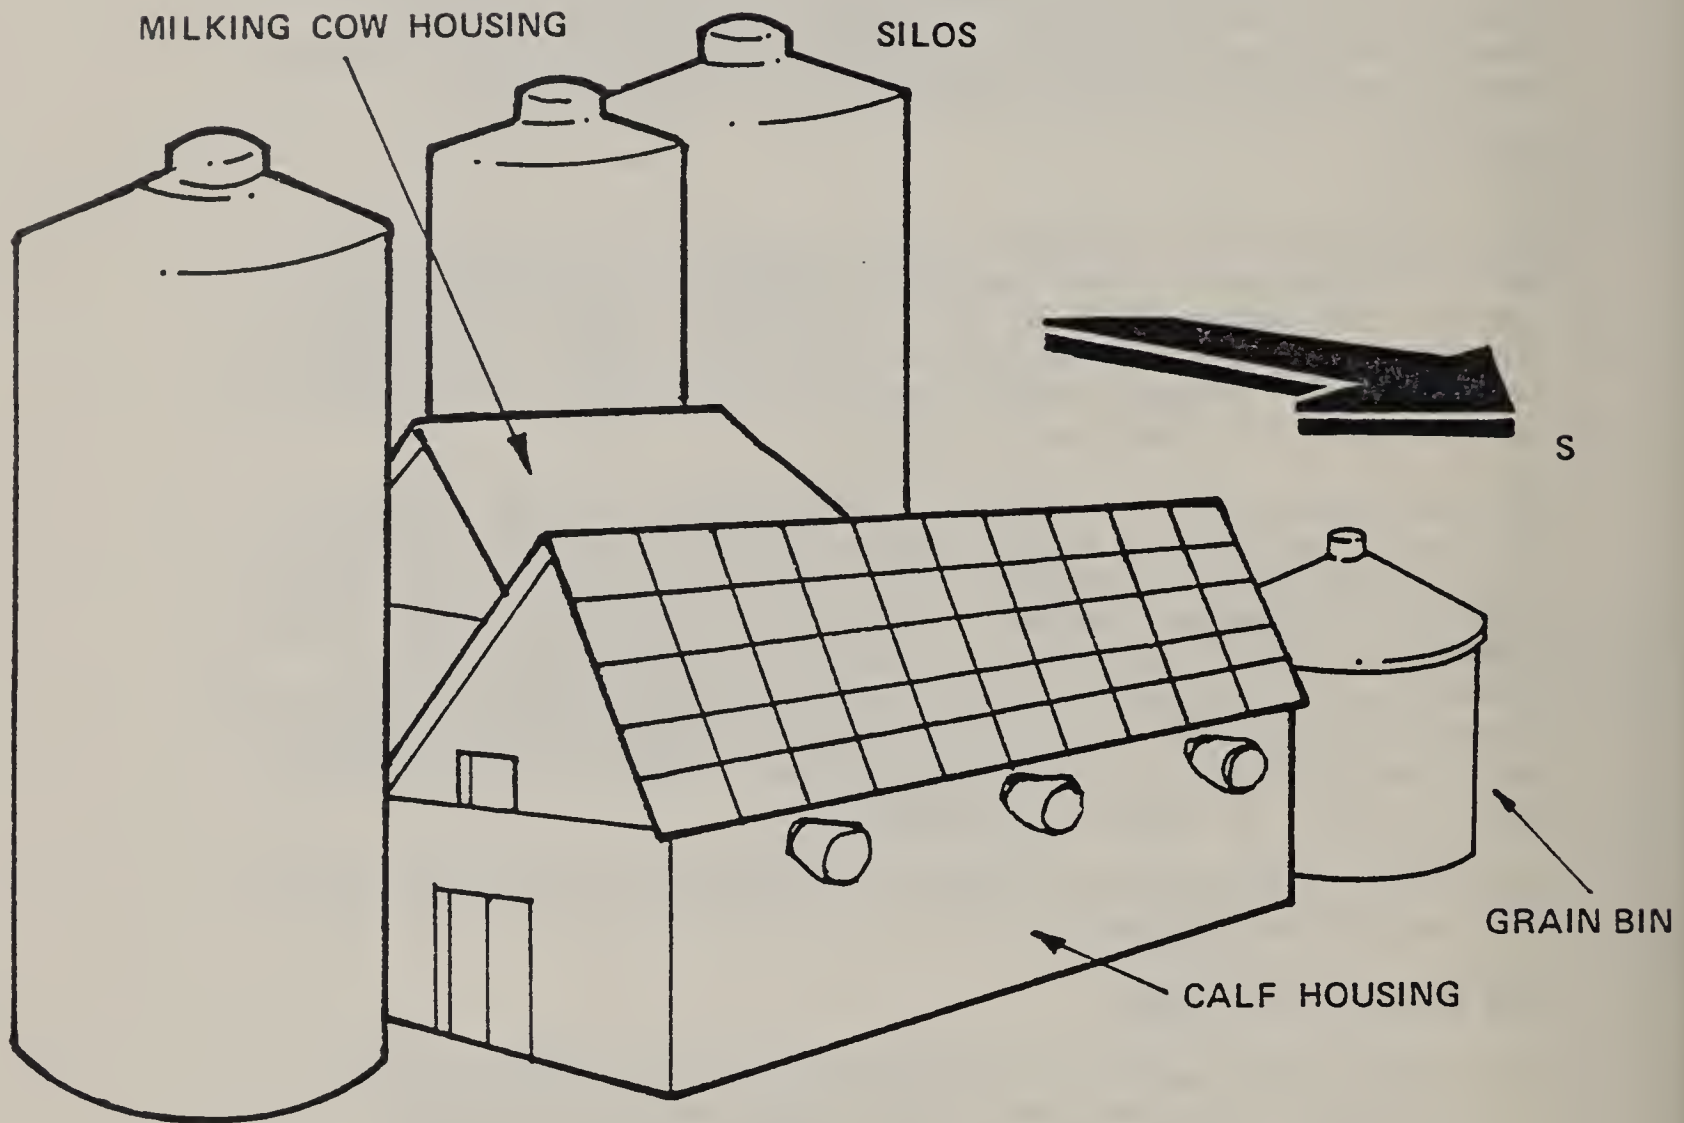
SCHEMATIC LAYOUT OF THE BUILDINGS ON THE GIDLOF FARM.
